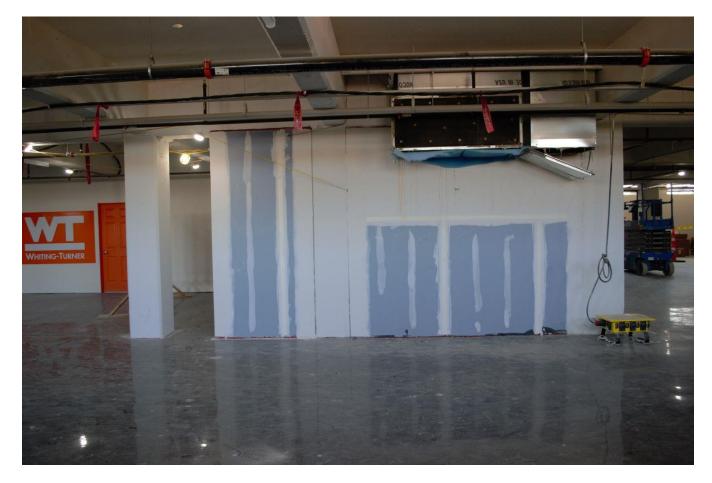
Pedestrian and vehicle openings, northwest corner of basement, looking north.
